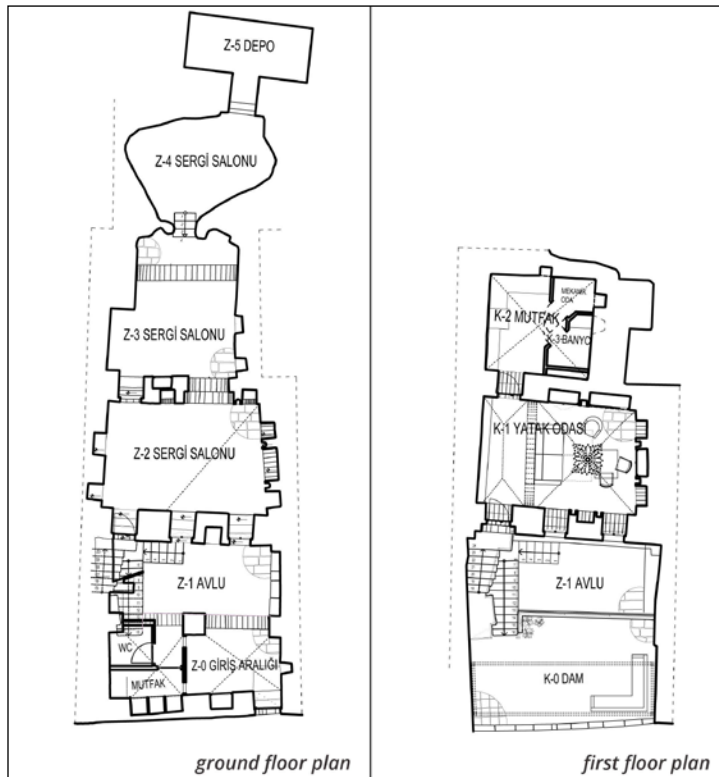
Ground & first floor plans. Source: KMKD Tamirevi Archive
